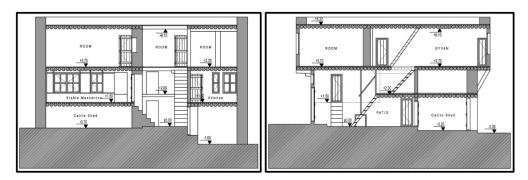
Section Drawings of a Village House with "Stable Mezzanine".
